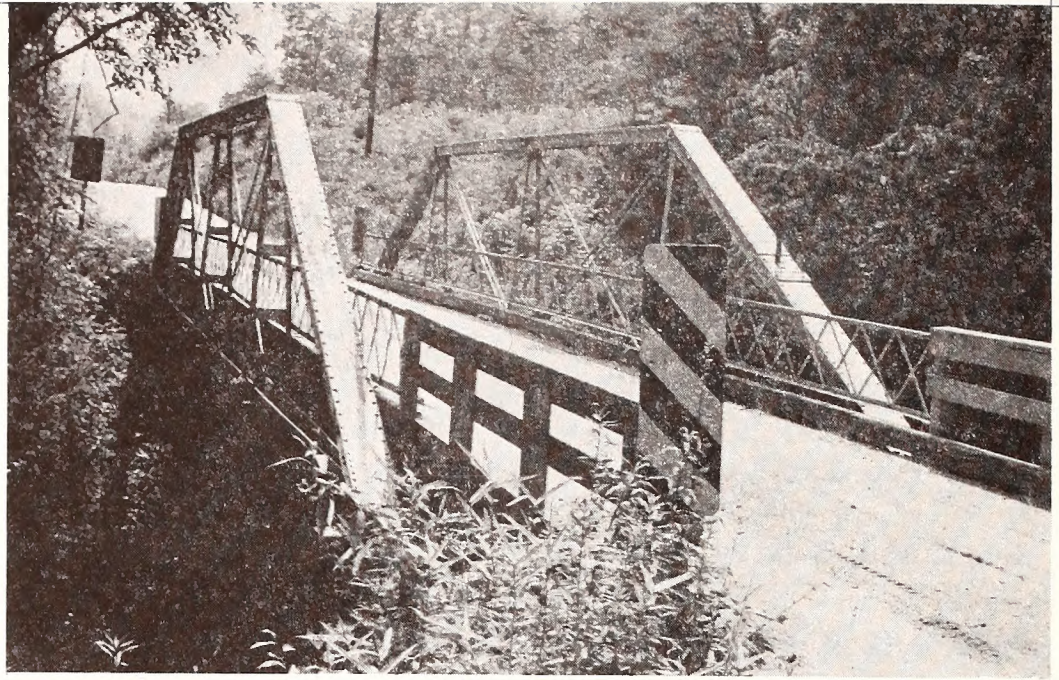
Stokes #197 is the oldest Pony Truss in North Carolina. Below, a bridge plate giving credit to the officials who were in office when the bridge was built.
